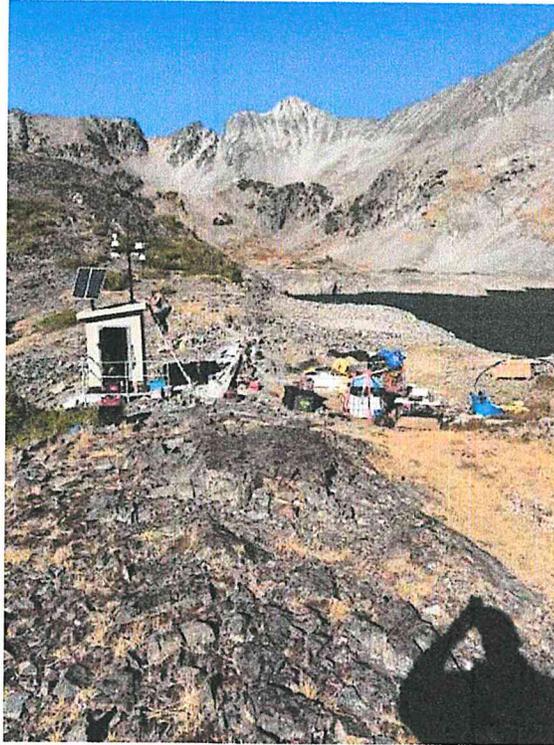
Exterior of new control building at Rock Lake Dam, NESWSW Section 11, T3N R11E.
